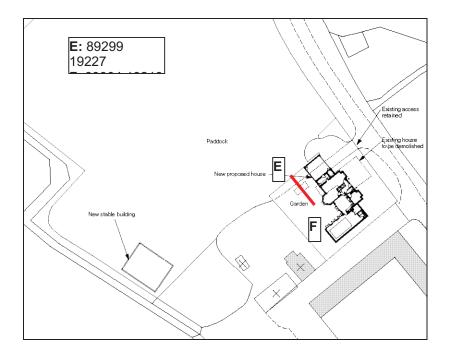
Stud Cottage proposed development with trench locations (scale 1:1000)
